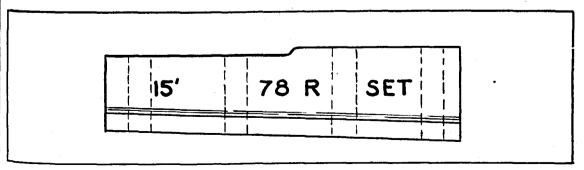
1939 STANDARD HEEL BLOCK FOR 78 & 86 LB. POINTS
